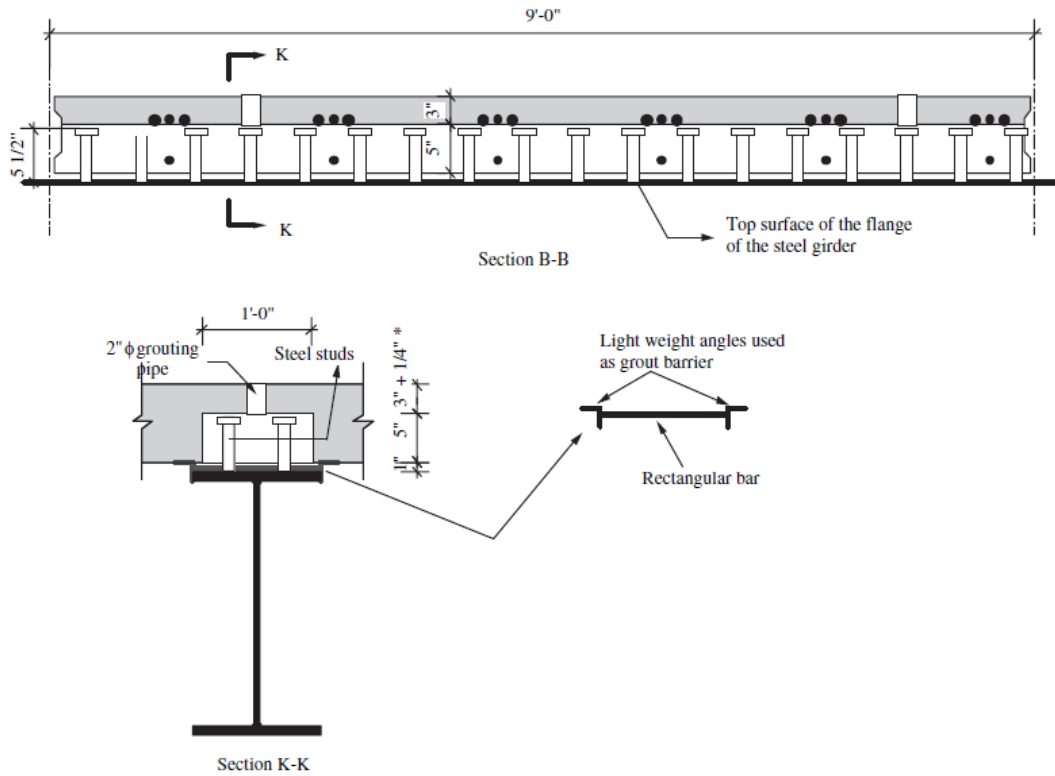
NCHRP System CD-2 Longitudinal Connection Details (Badie and Tadros 2008)
